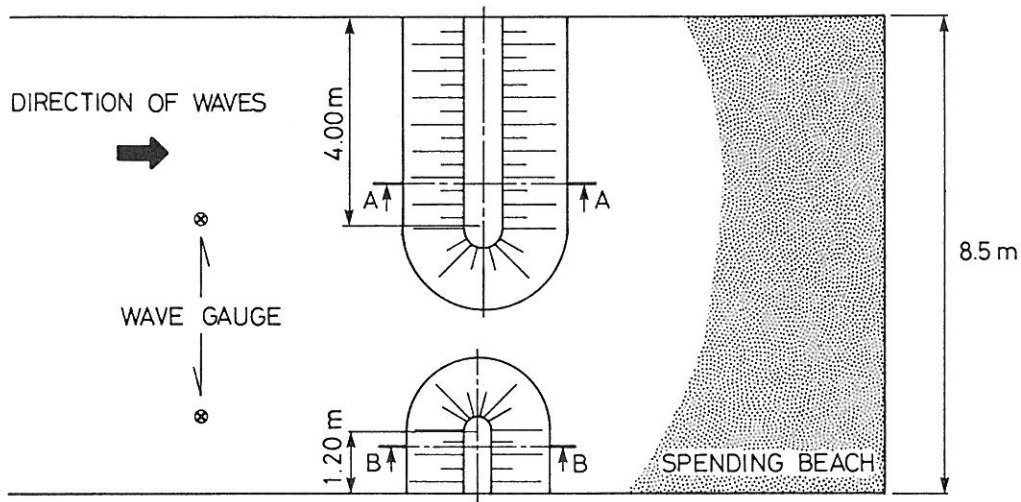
Lay-out and cross section of the model. (Continued on next page).
